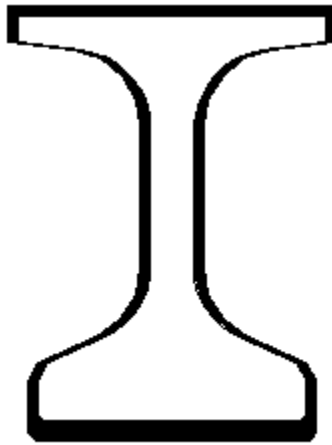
Modified BTCHIO Girder Superimposed on a Typical BTCHIO.
